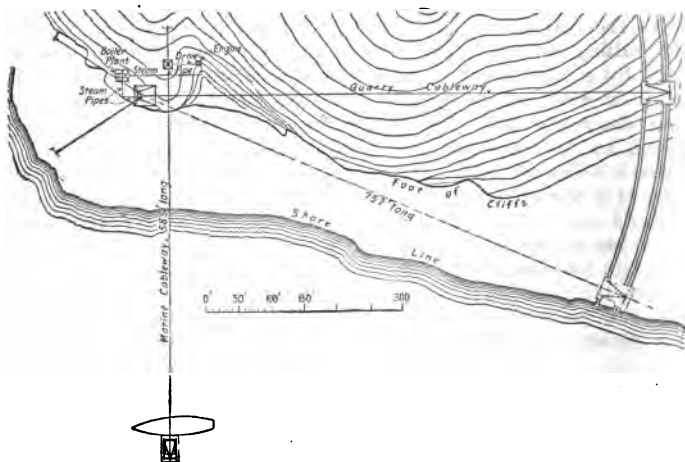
Layout of Rock Transporting Plant on the Desert Island of Kalagouk, Bay of Bengal.
